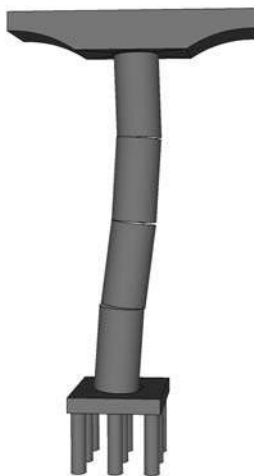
Unbonded Segmented Bridge Substructure Subjected to Earthquake Motion
